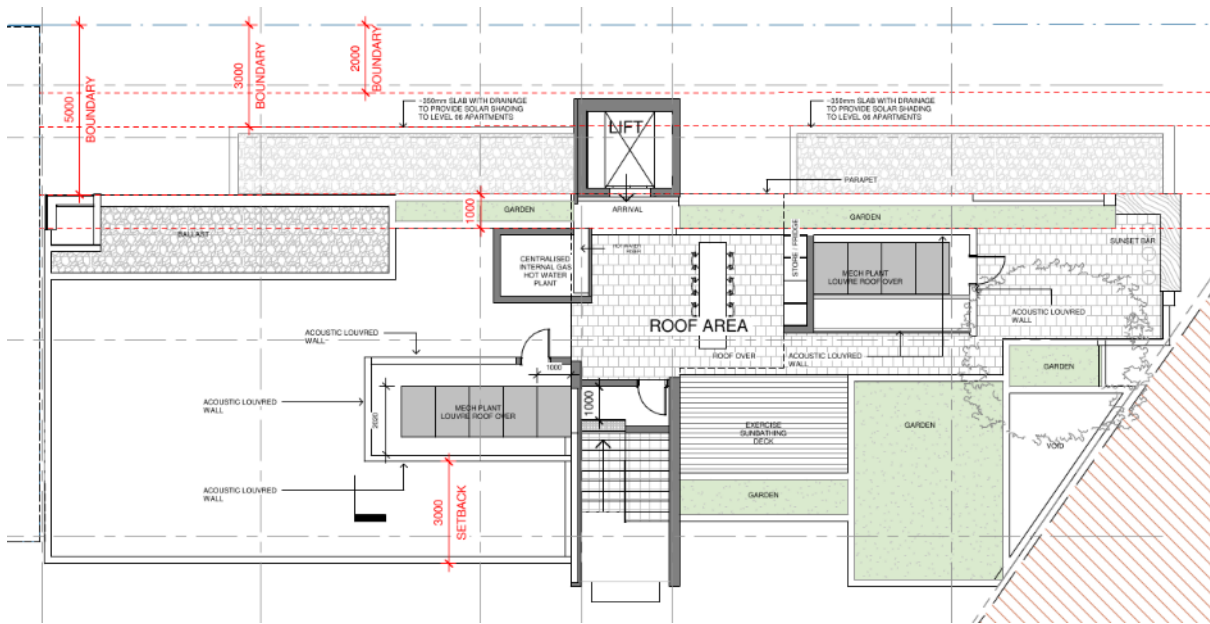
Level 7 plan: Young Street North Building, additional communal private open space
